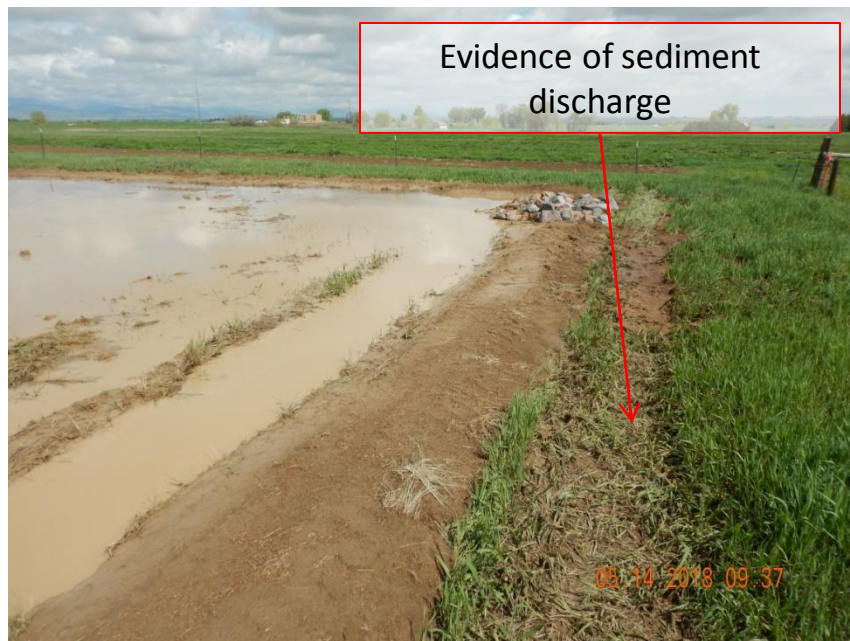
Photo taken from the northwest perimeter of the location, facing North. Sediment laden stormwater has discharged off location. Ditch and berm BMP and rip-rap are not sufficient to prevent sediment laden stormwater from discharging off location. Operator needs to installed sufficient erosion and sediment control BMP immediately.
